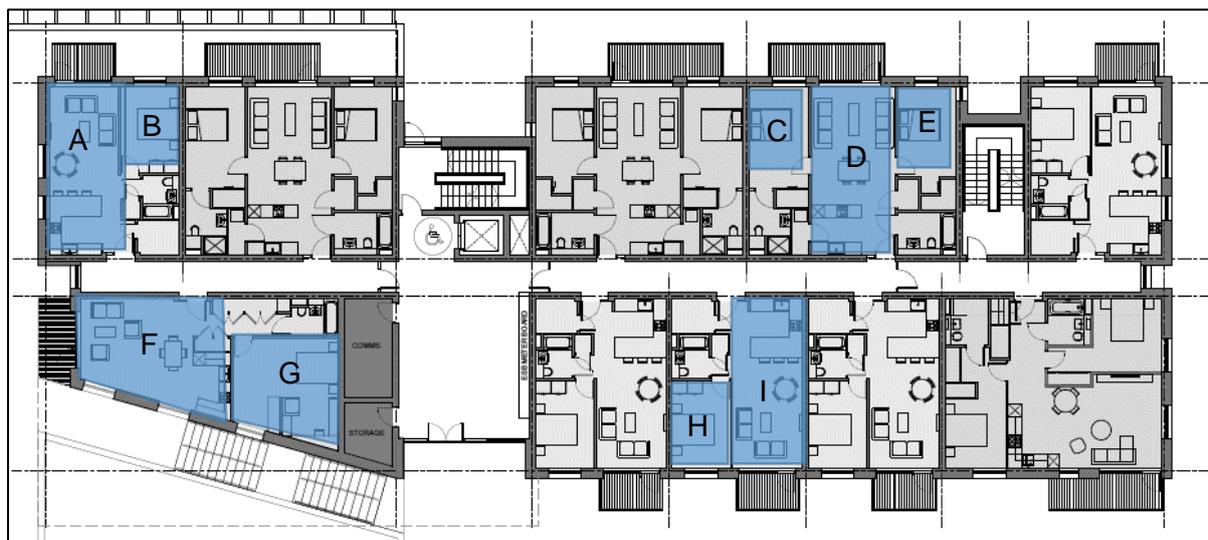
Block A – Upper Ground Floor Assessed Rooms Highlighted in Blue
